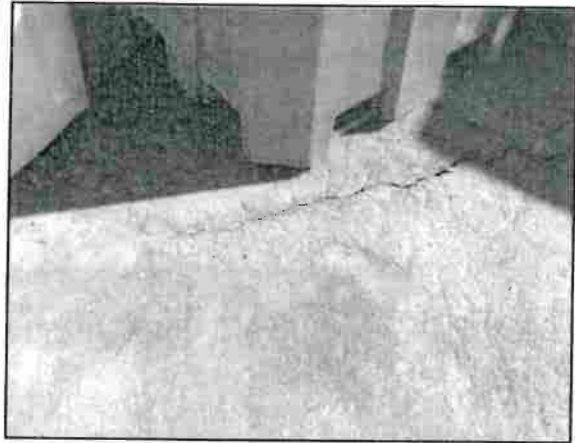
Typical crack in the pavement as a result of loss of soil fill below.
